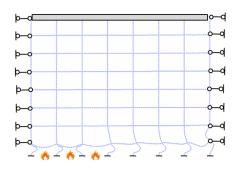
Failure mode of the frame with combined bracing under edge multi-compartment fire on the ground floor
